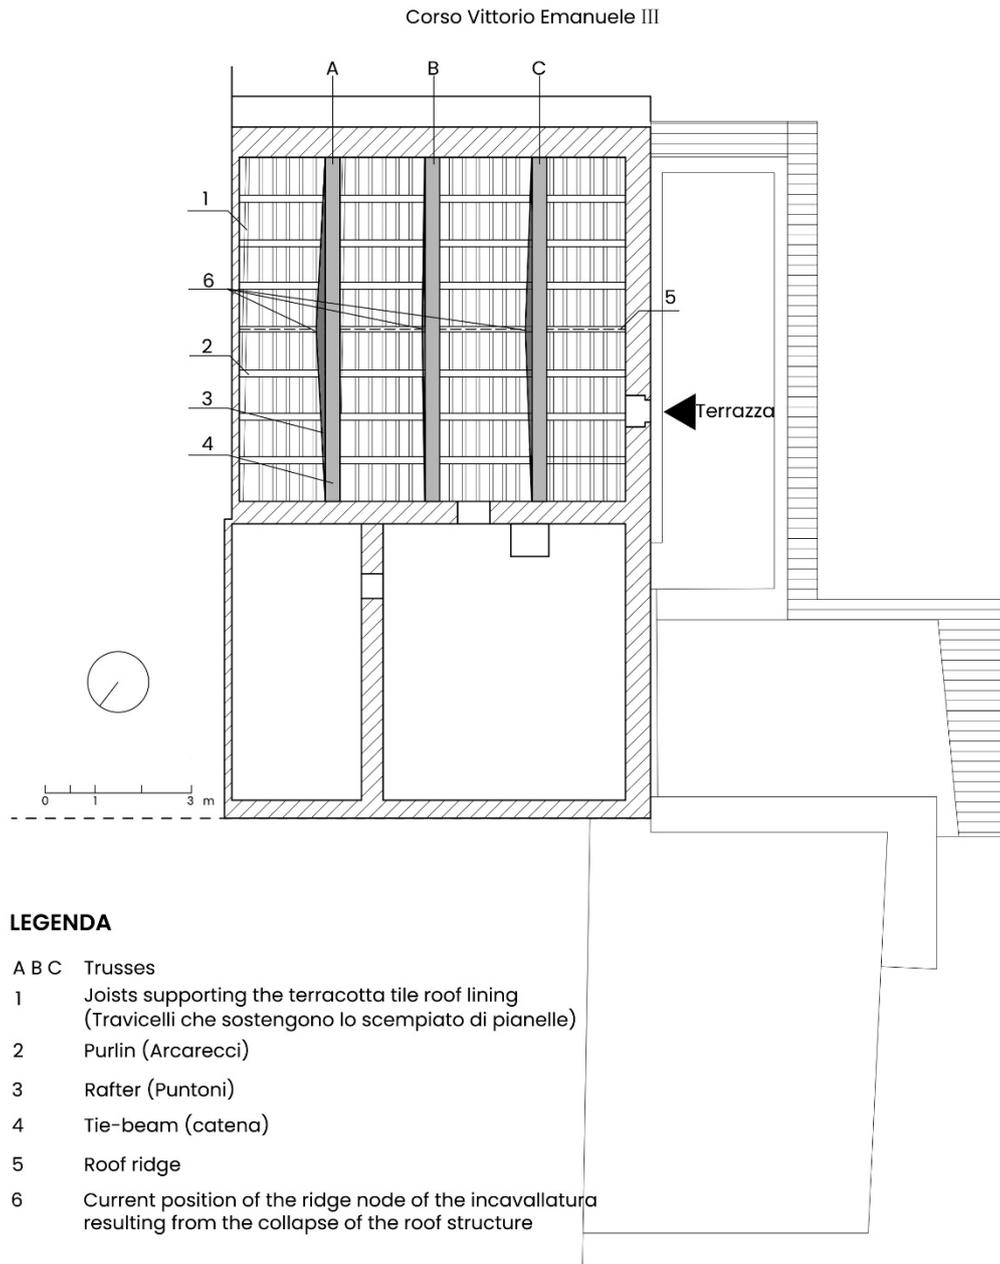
Plan of the attic level from below before restoration and indicates the location of the attic on the floor plan
